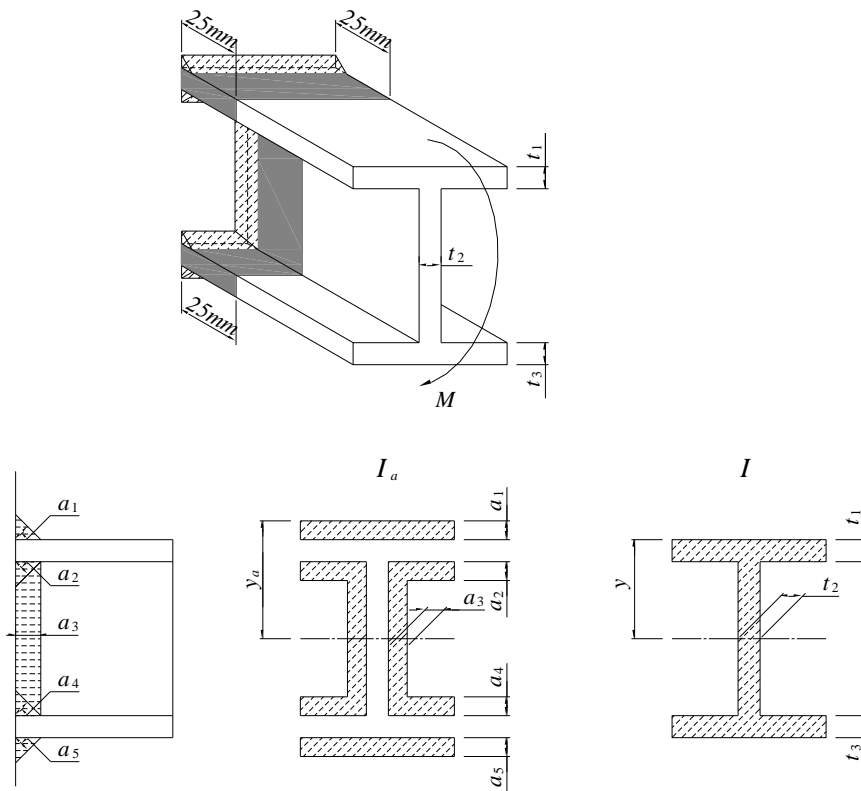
Fillet Welded Joint Subjected to Bending Moment
